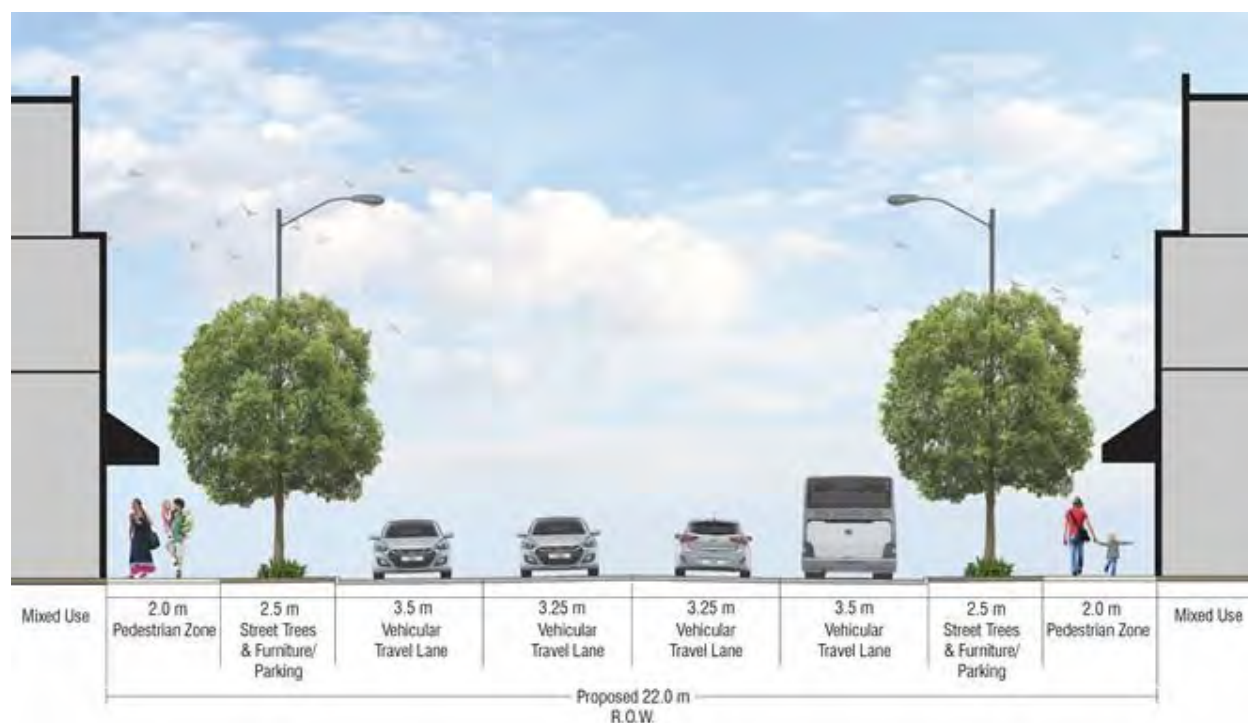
Suggested right-of-way cross section for a 20m local road
